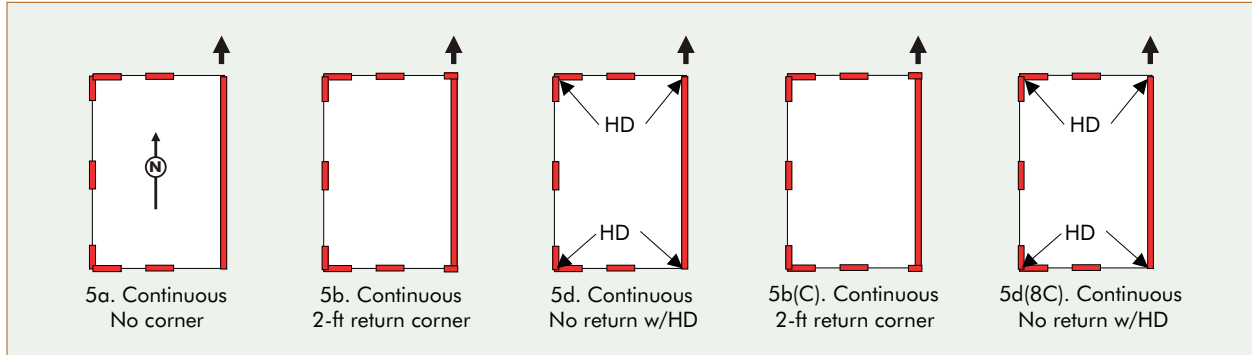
Five house plans examined in this progress report. Note the north direction, shown on Test 5a, is typical for each test. The “C” used within the test designation, e.g., 5b(C) and 5d(8C), indicates that sheathing was “Cut” around the openings for those tests on the east wall.
